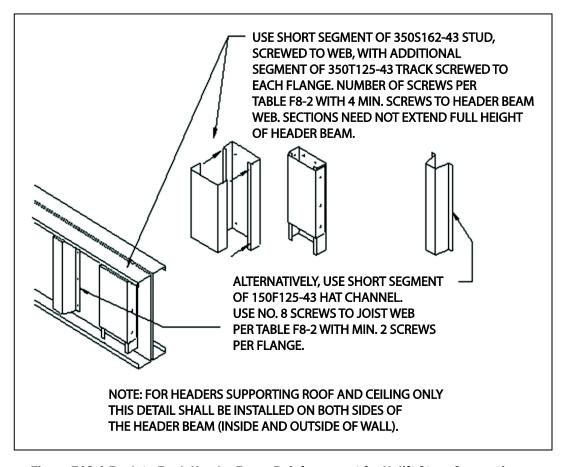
Back-to-Back Header Beam Reinforcement for Uplift Strap Connection
